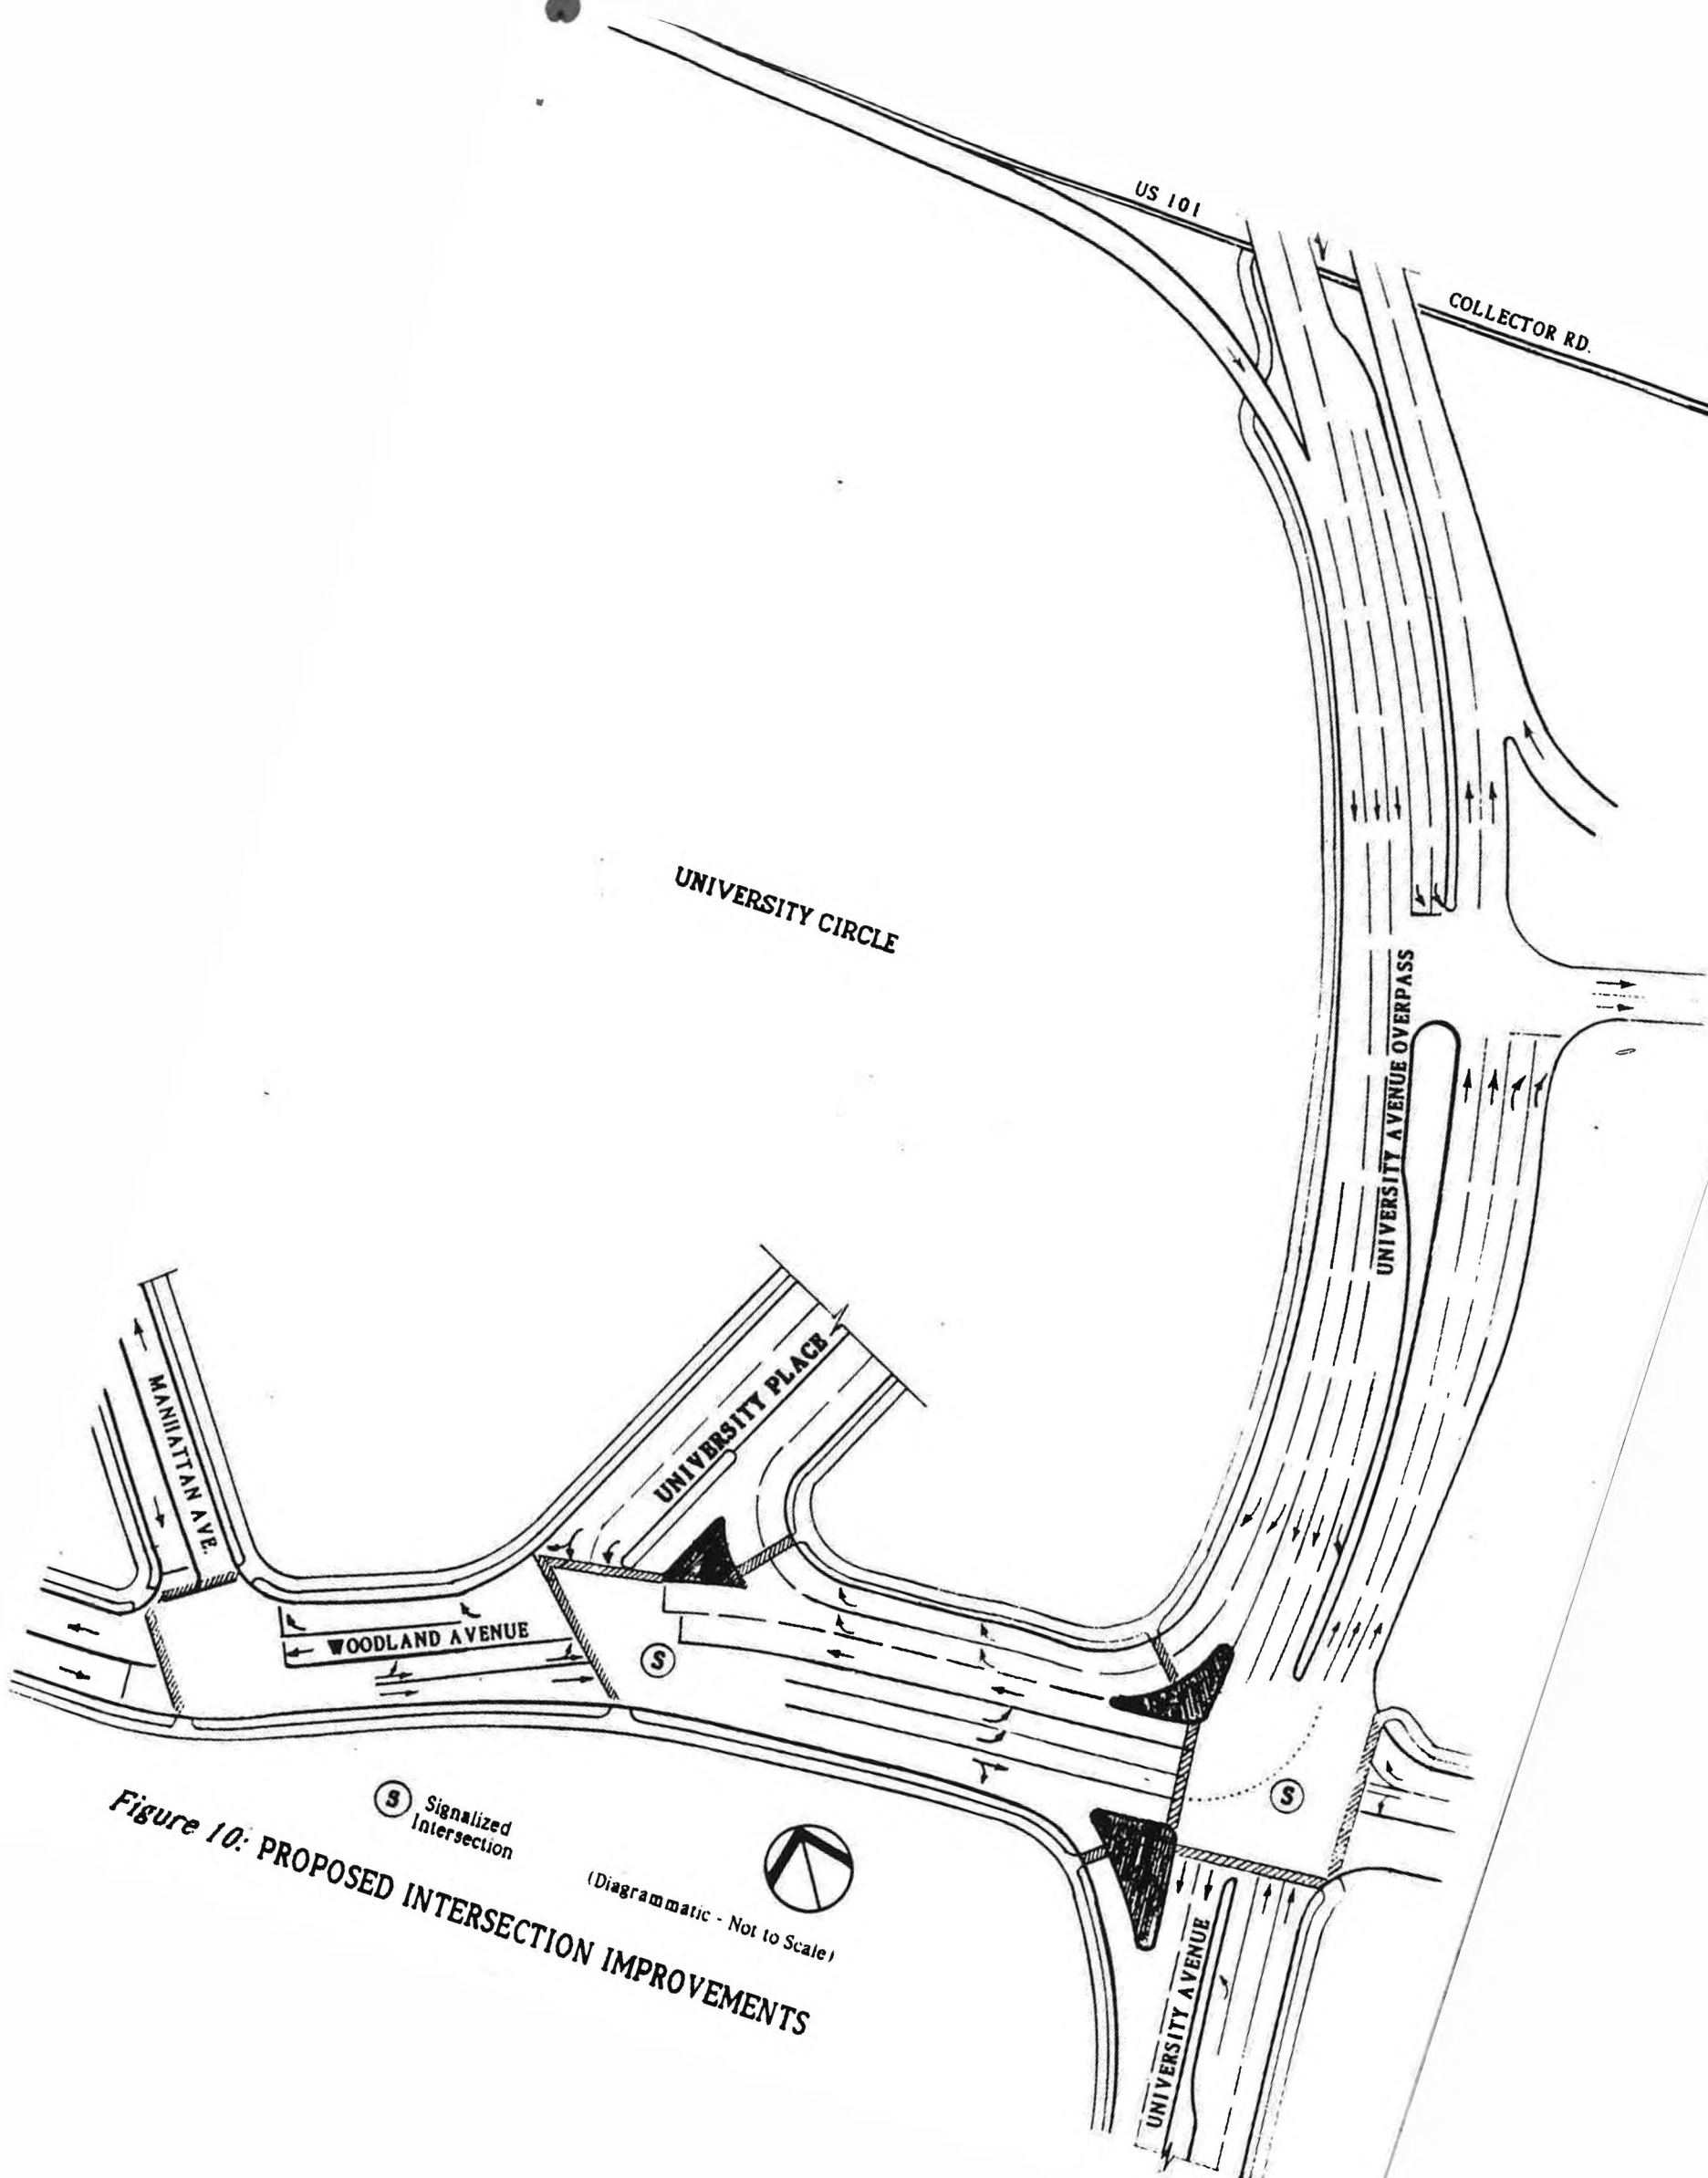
PROPOSED INTERSECTION IMPROVEMENTS
